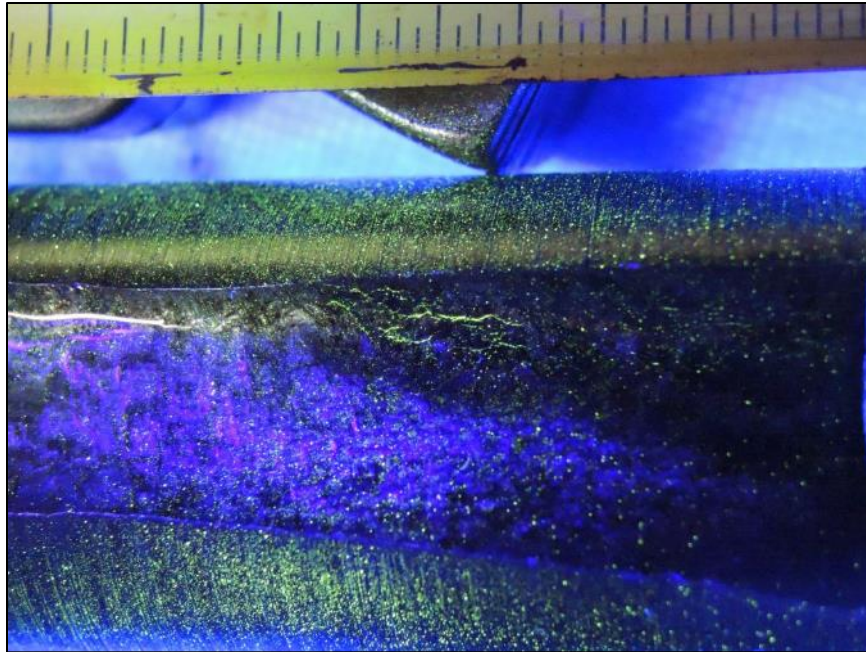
Representative image of the flange weld access hole surface of core sample D-SW following wet fluorescent magnetic particle testing showing microcracks.
